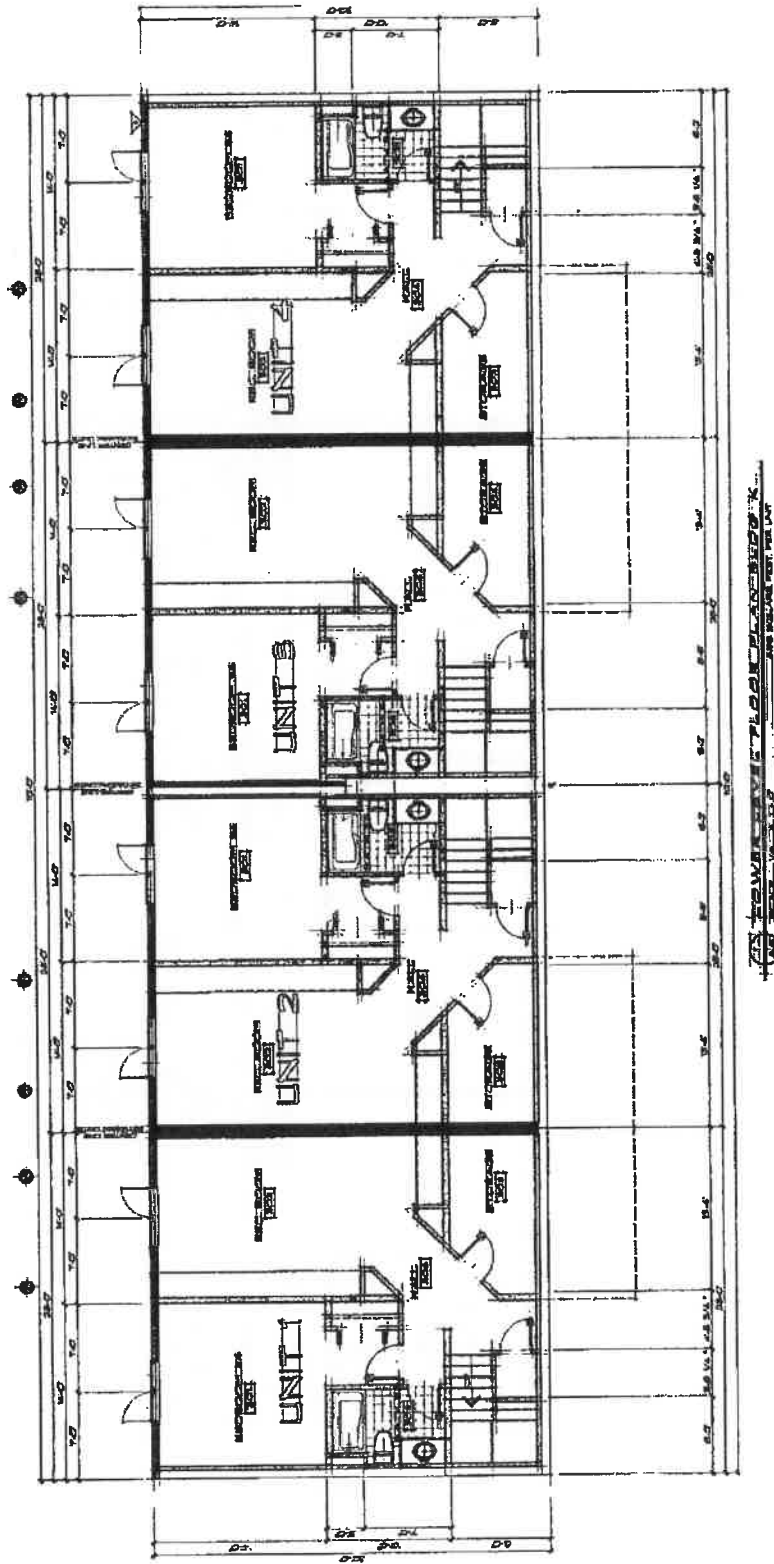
FLOOR PLANS & CERTIFICATE OF FLOOR PLANS (BUILDING L)
